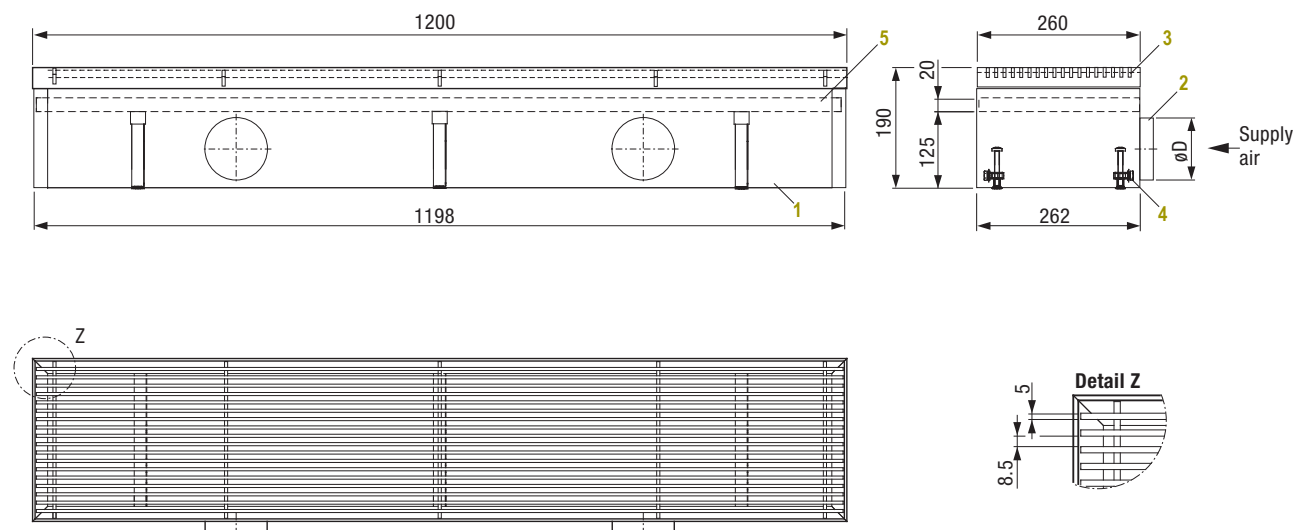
Standard dimensions of rectangular floor displacement outlet
